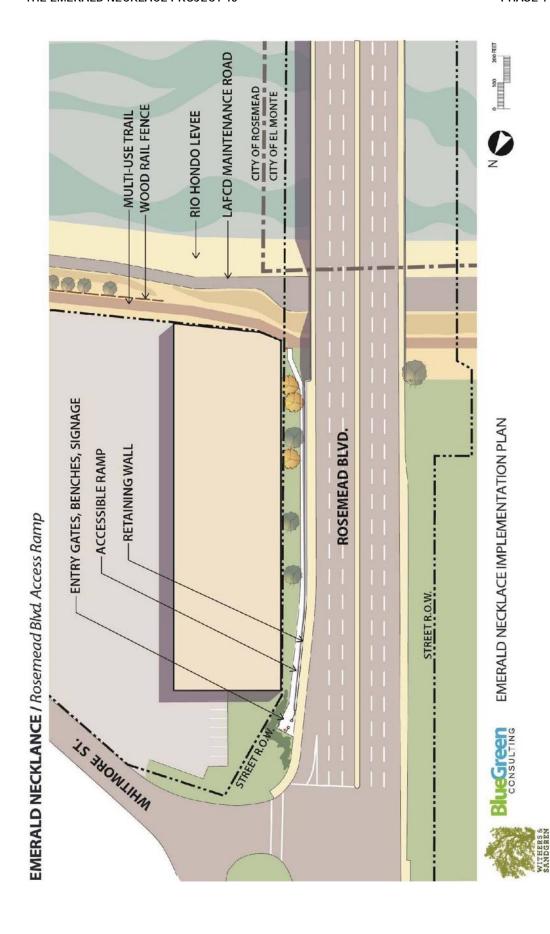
Plan view of the new access ramp from the north side of Rosemead Blvd. to the West Side Multi-Use Irail.
